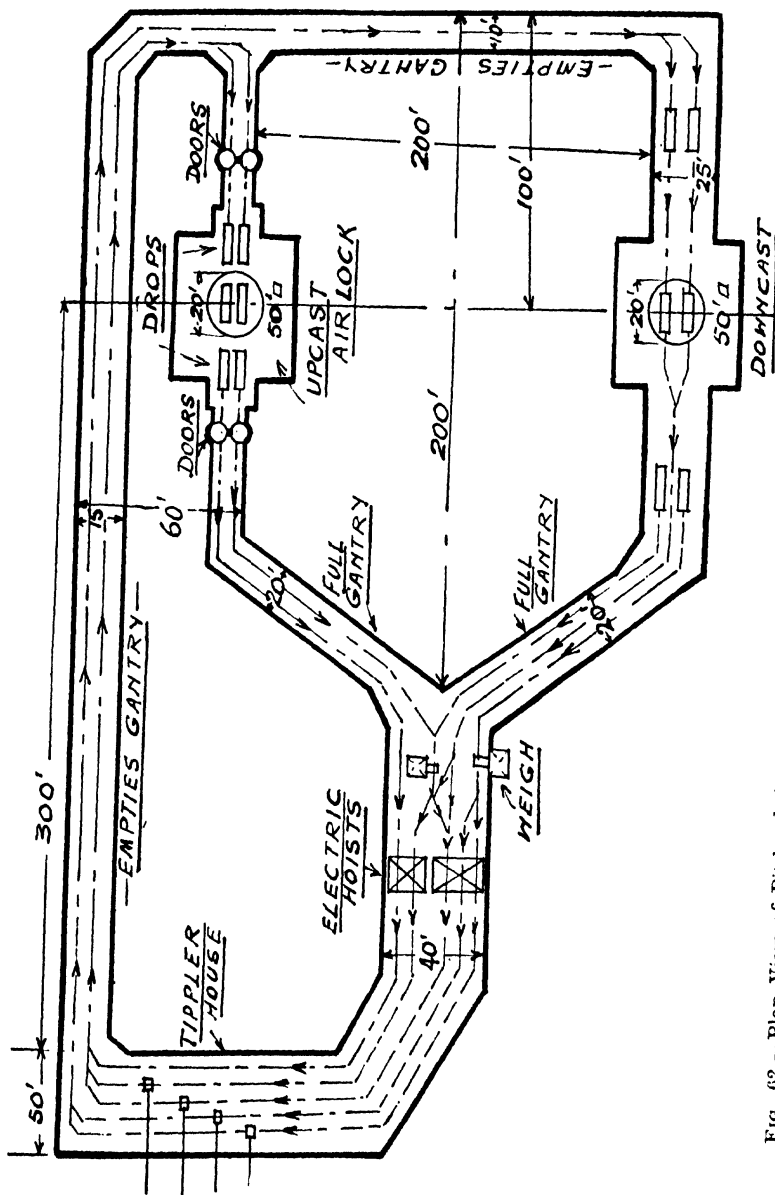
Plan View of Pit-head Arrangement with Drops, Gantries and Tipplers for Gravity Working.
